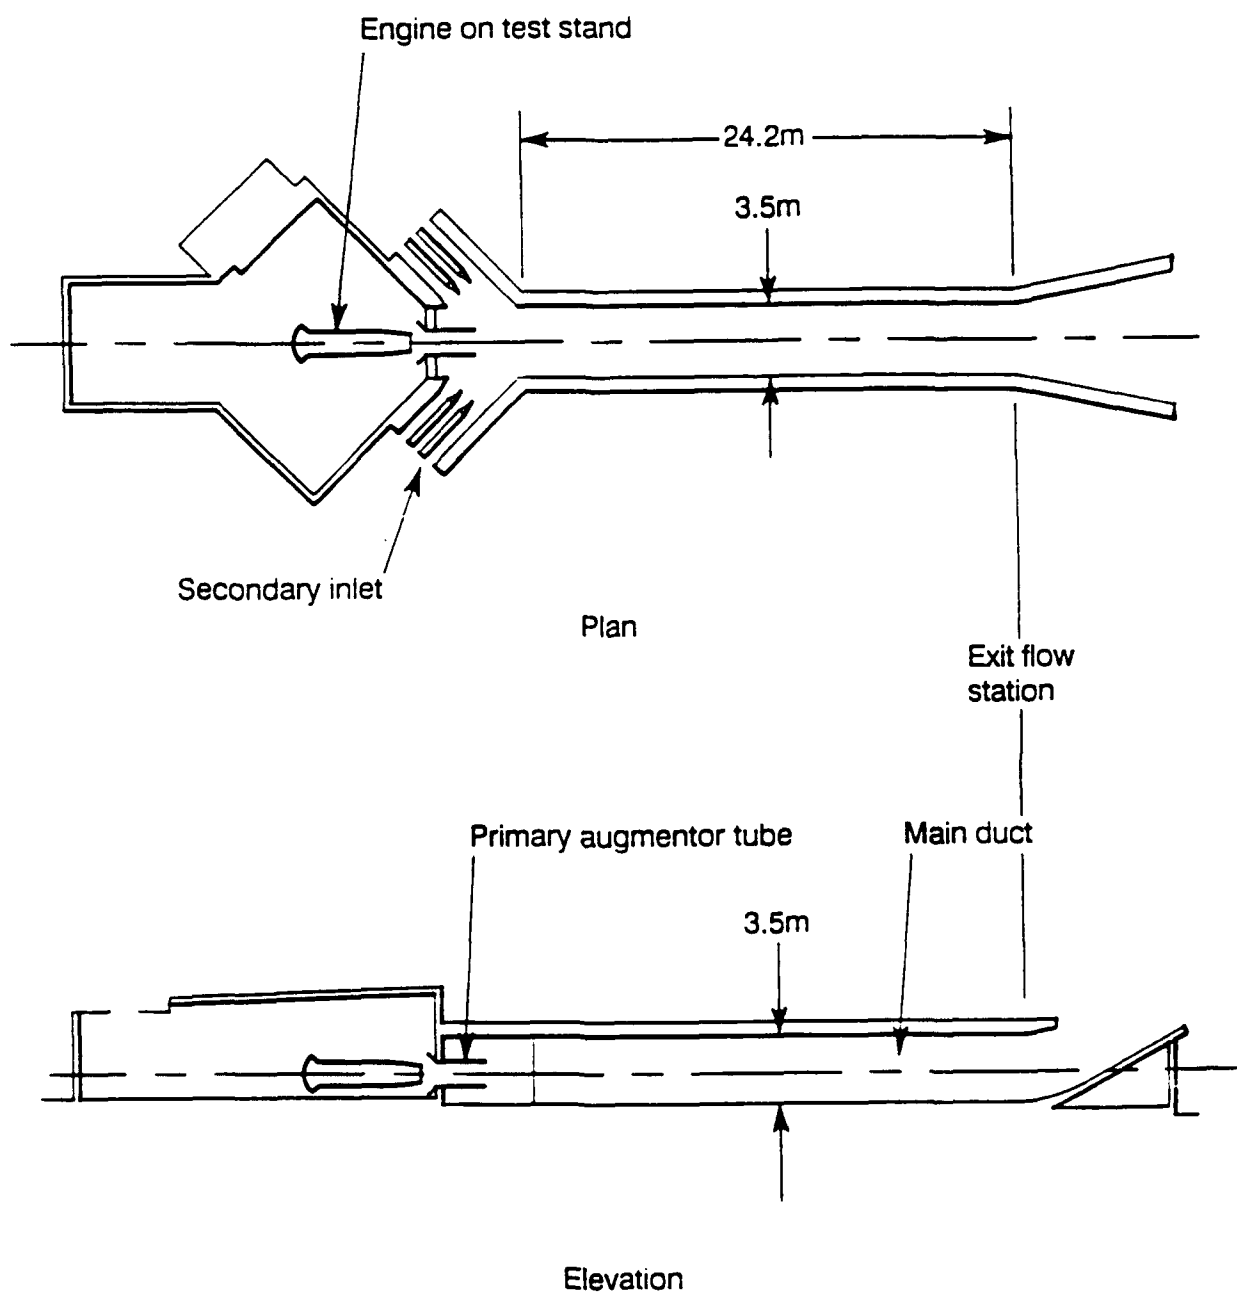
UNINSTALLED ENGINE TEST FACILITY - REVISED DESIGN
